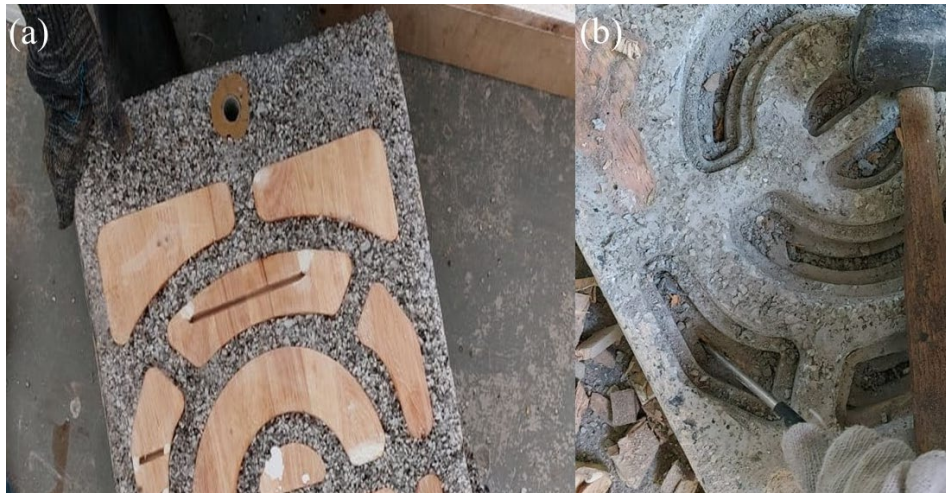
(a) CNC wood pieces stuck to casted model and (b) removal of CNC wood pieces via destruction (Source: Authors)
